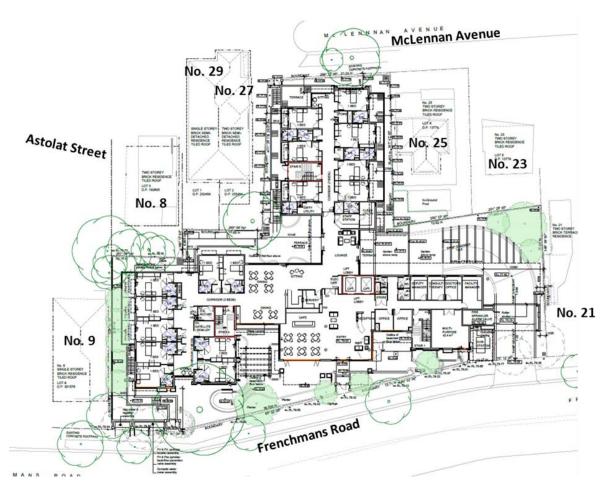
Extract of the ground floor plan of the building (source: boffa robertson group)
